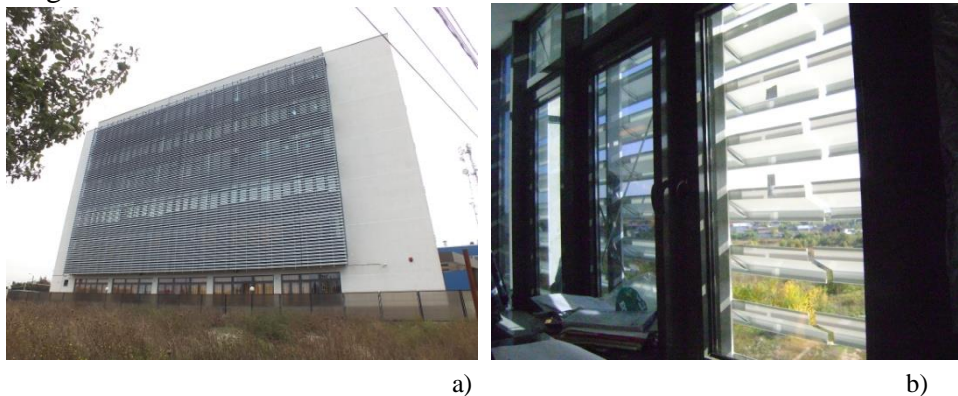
INCD-ECOIND building: a) South façade; b) exterior metallic louvers, view from indoor
